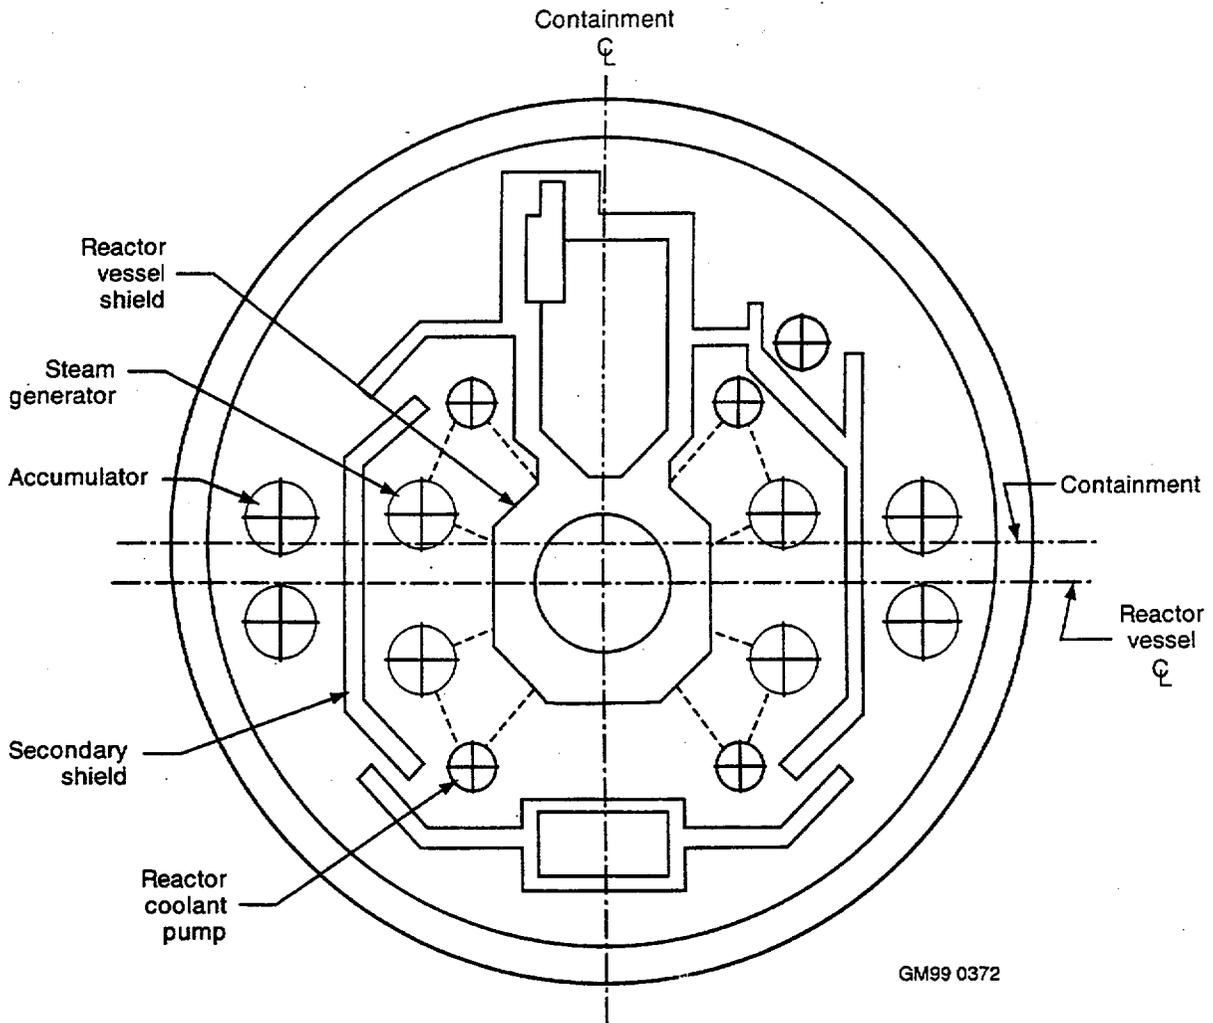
Newer SEP-III PWR (Westinghouse 4-loop) inside containment plan view.
